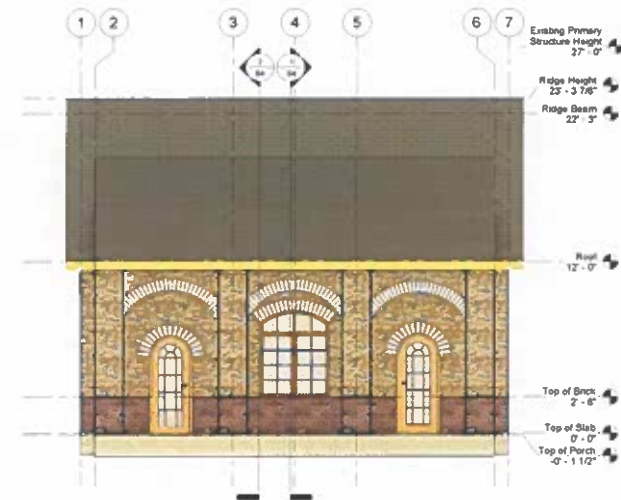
EXHIBIT D - FLOOR PLAN/EXTERIOR ELEVATIONS
